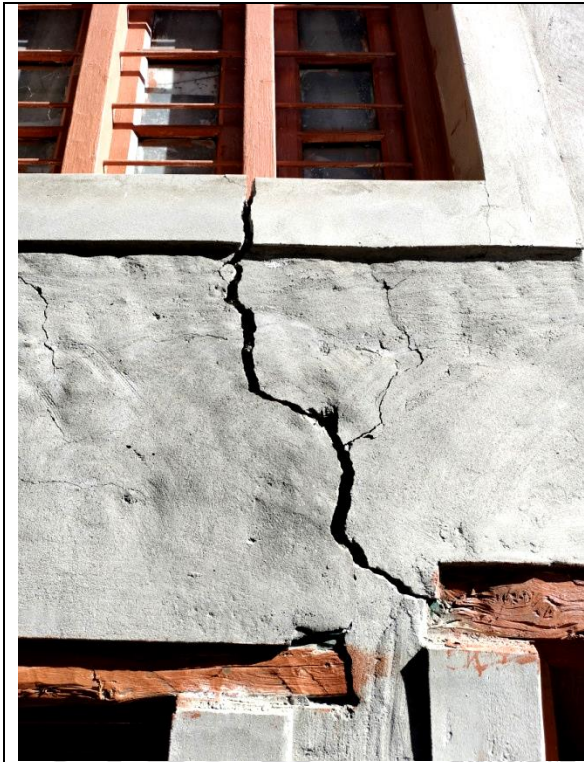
Step cracks with 2.6 cm opening seen in a mud house.
